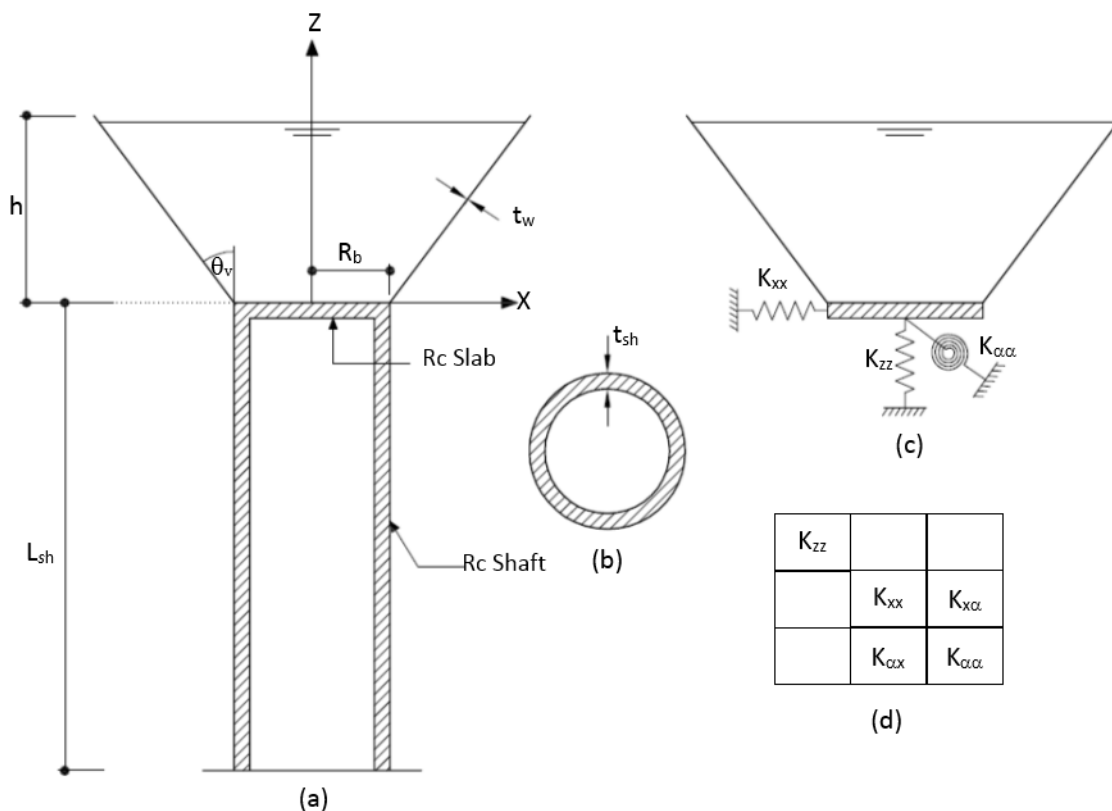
(a) Elevated tank structure, (b) RC shaft cross-section, (c) Springs simulating the RC shaft, and (d) RC shaft stiffness matrix
